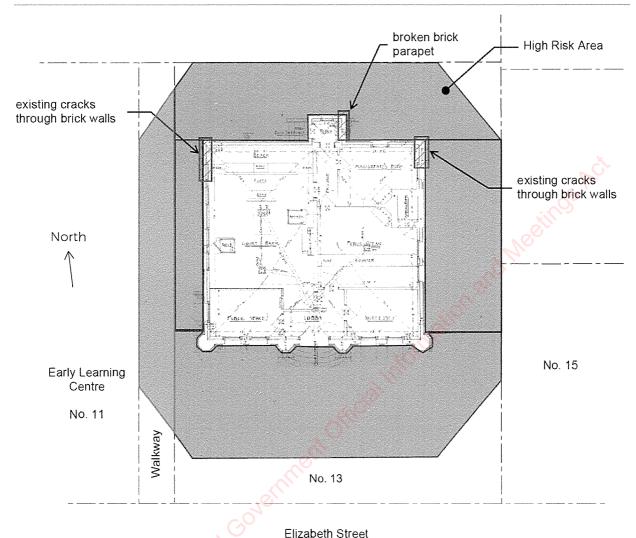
Site Plan of 13 Elizabeth Street, Petone showing extent of High Risk Area
